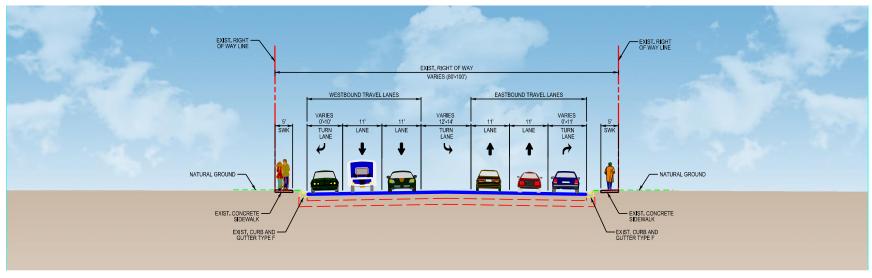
Typical Section - Lantana Road from Shopping Center Dr to Andrew Redding Road
